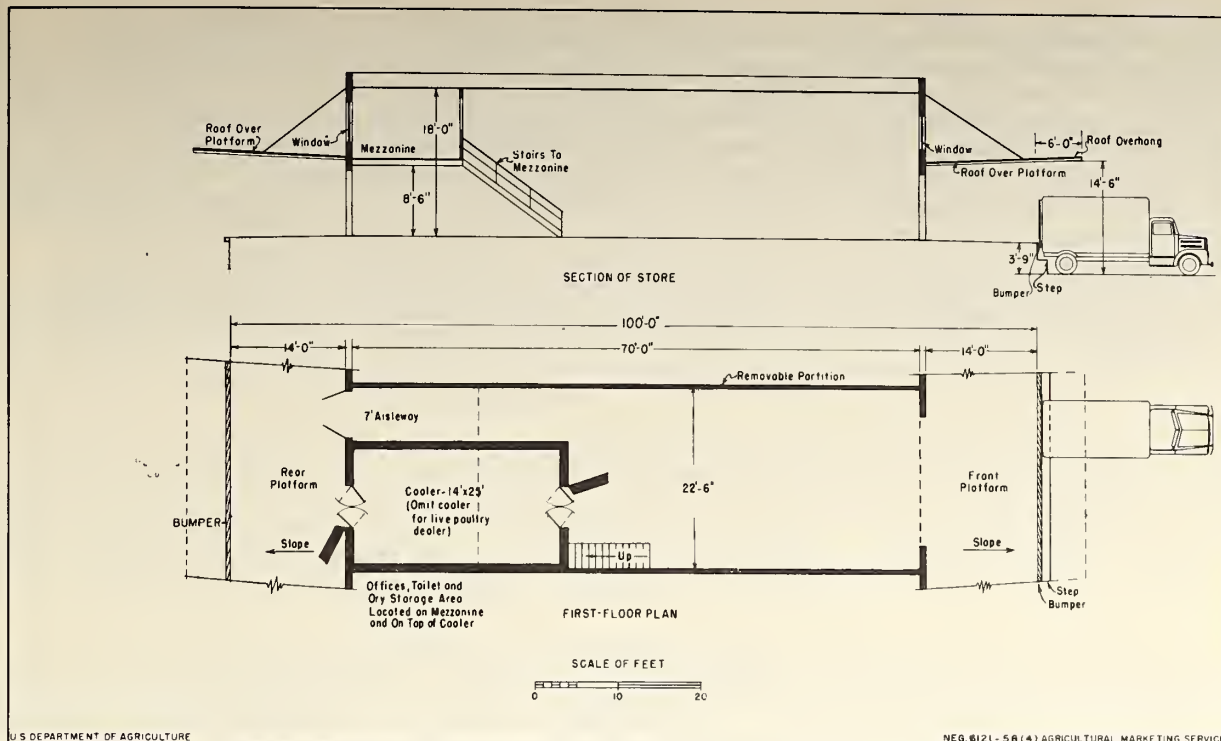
Suggested plan for facilities for poultry, eggs, and dairy product wholesalers.
